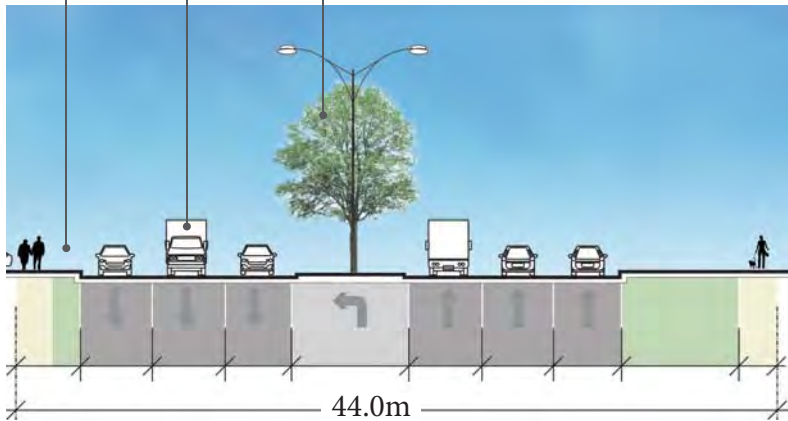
Existing Street Design of 8<sup>th</sup> Street (portion)
